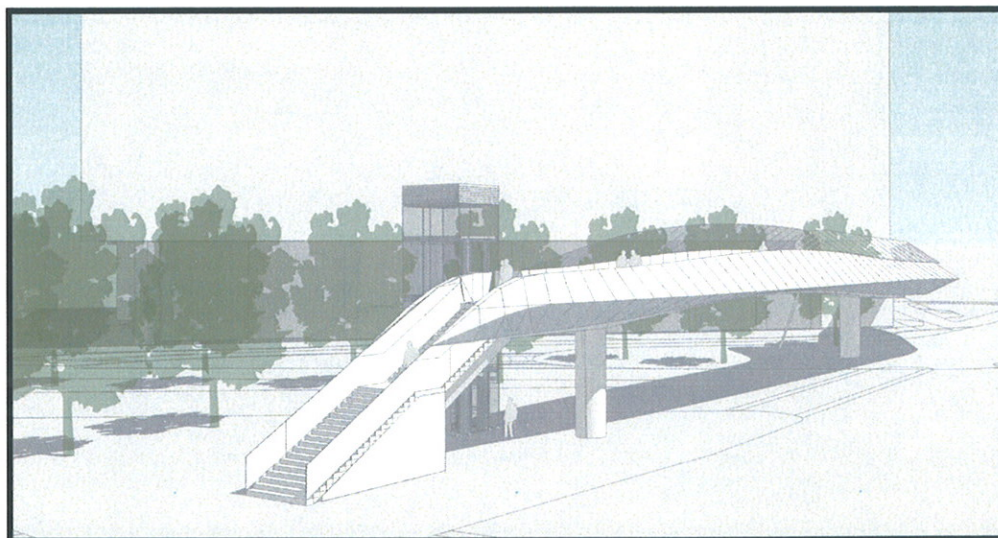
View of Pedestrian Footbridge from Bathurst Street (east)
